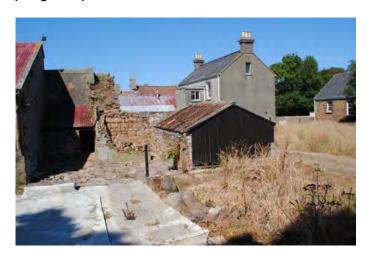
View of Ponterrin Villa (right) in front of which is the area of the proposed cellar, western outbuilding (ahead) and ruined building (left) from S
